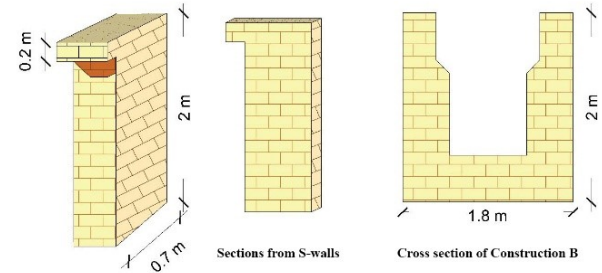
3D sections and cross-sections of mudbrick walls and construction B.
